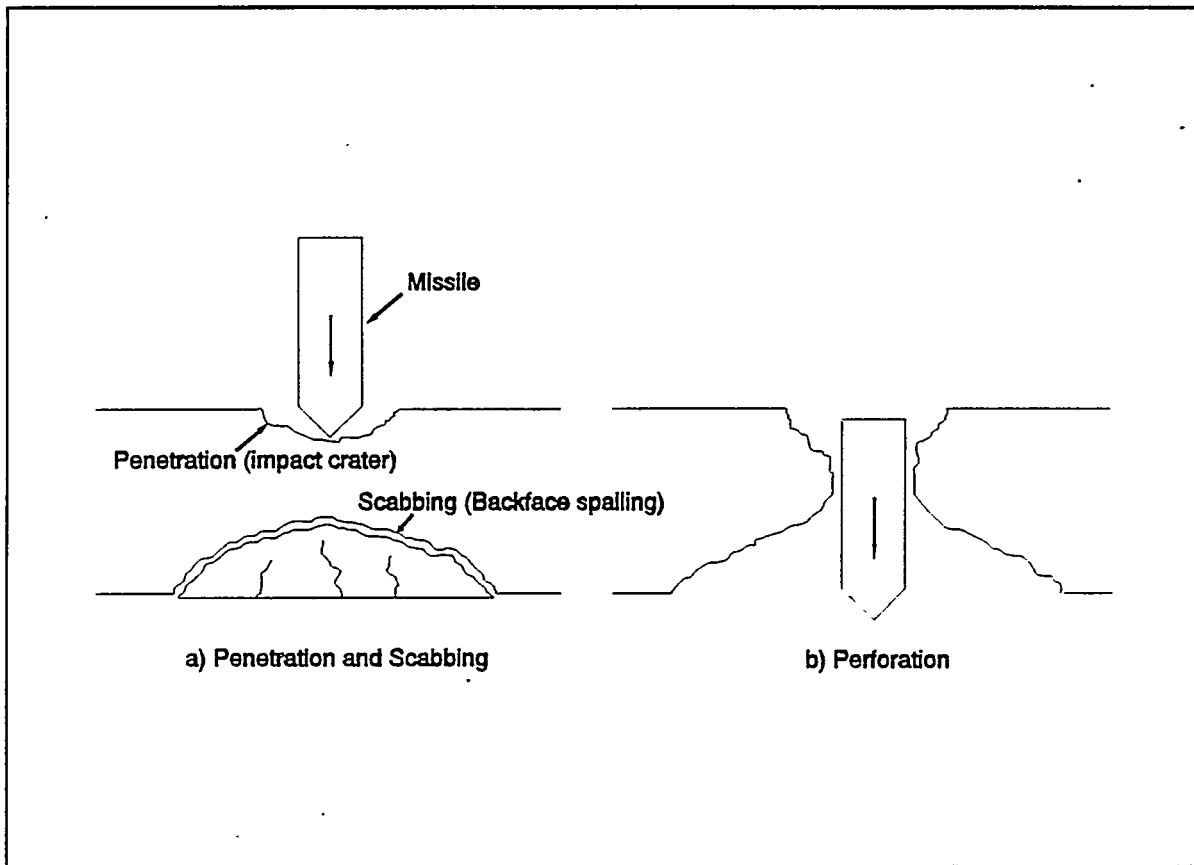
Concrete Slab Missile Impact Damage Term Definitions.
